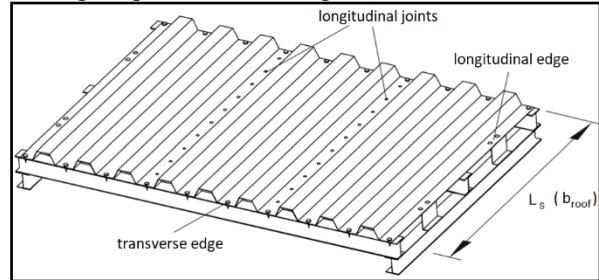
An example of a roof panel with fastening of profiled deck to the purlins on all four edges
